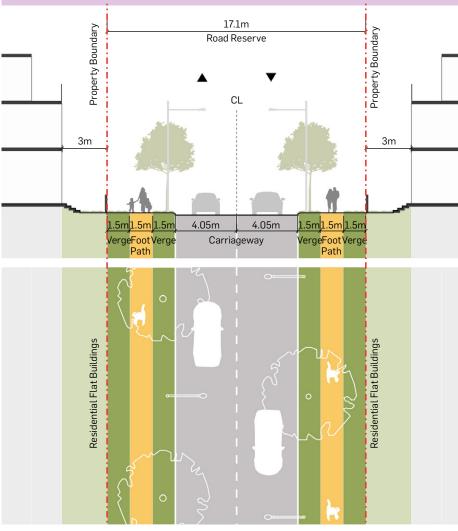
Indicative Street Section D-D' - Local Road - Type 5
